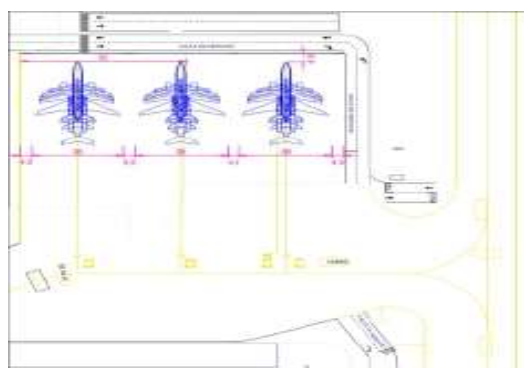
Plan drawing of configuration 1 of the second proposal for the loading platform.
